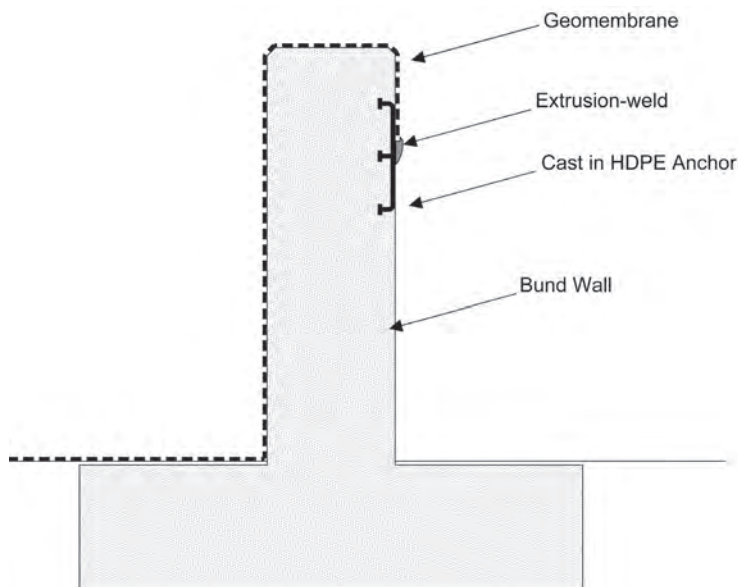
Typical arrangements for anchoring liner to concrete bund wall
